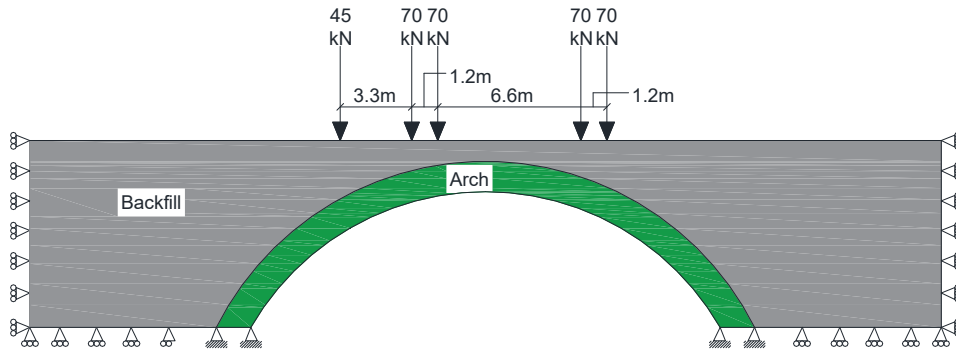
Loading at Crown, Legal Truck Type-3-2
